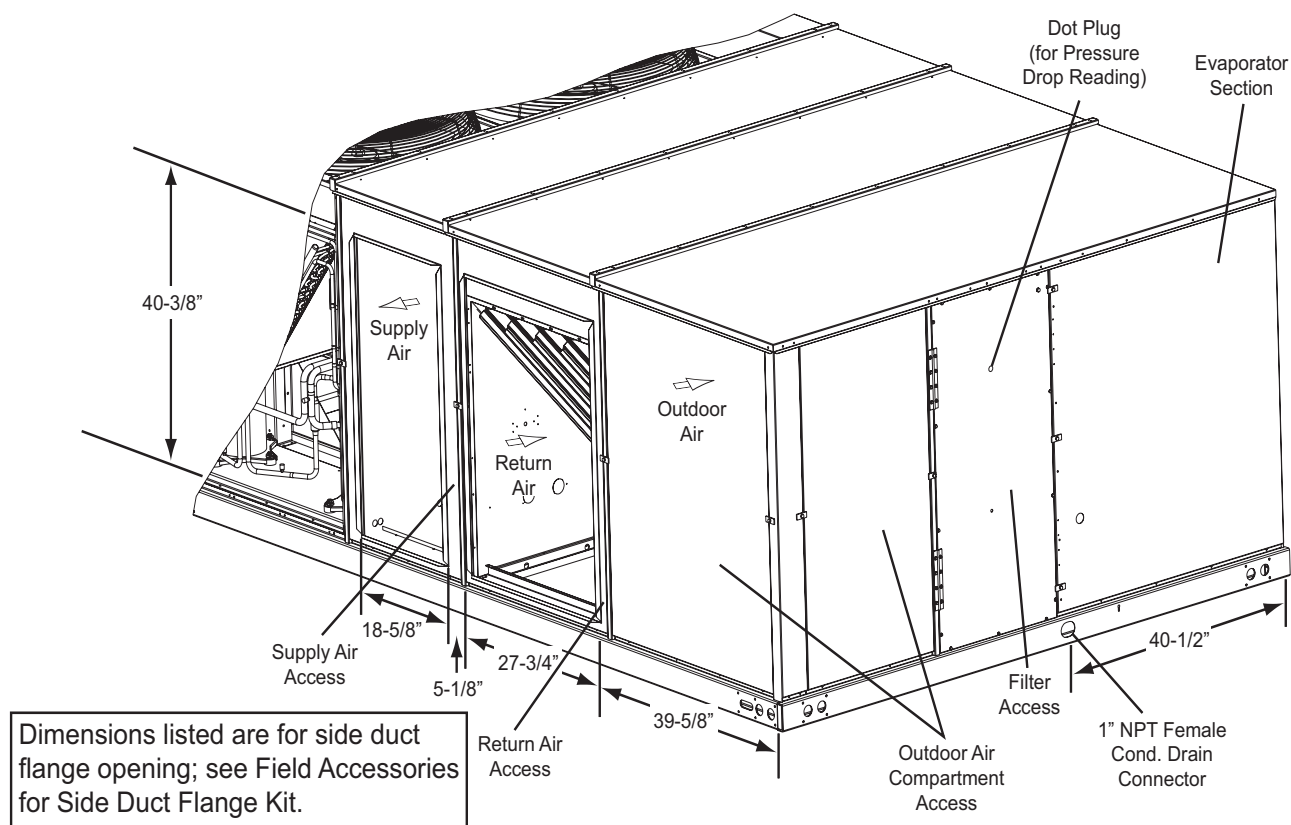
J15 thru 25 ZR Unit Dimensions Rear View
